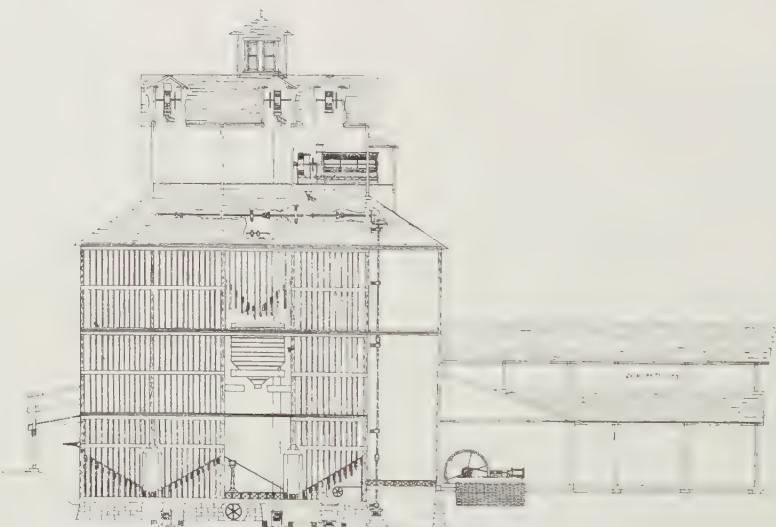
Side Elevation Crocker's Elevator at Maroa, Ill.
